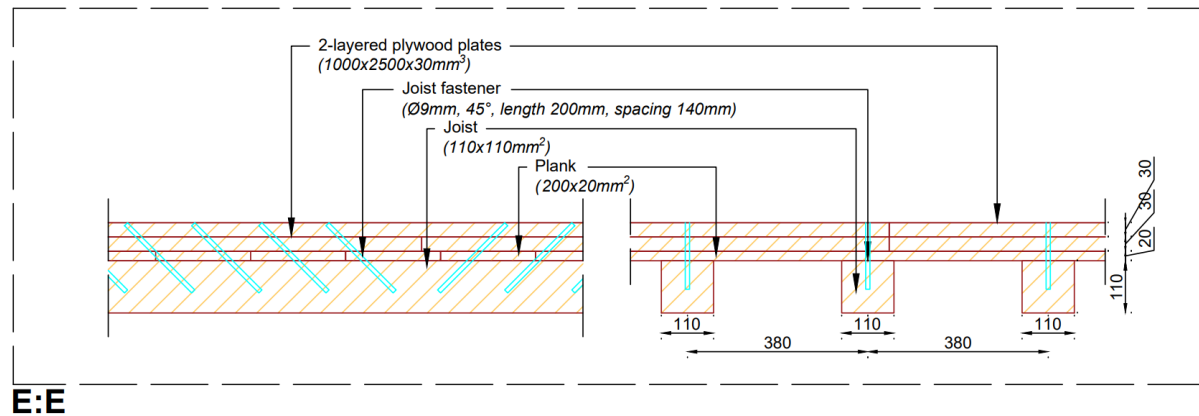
Detail E:E of Figure 7.8, strengthened joist
